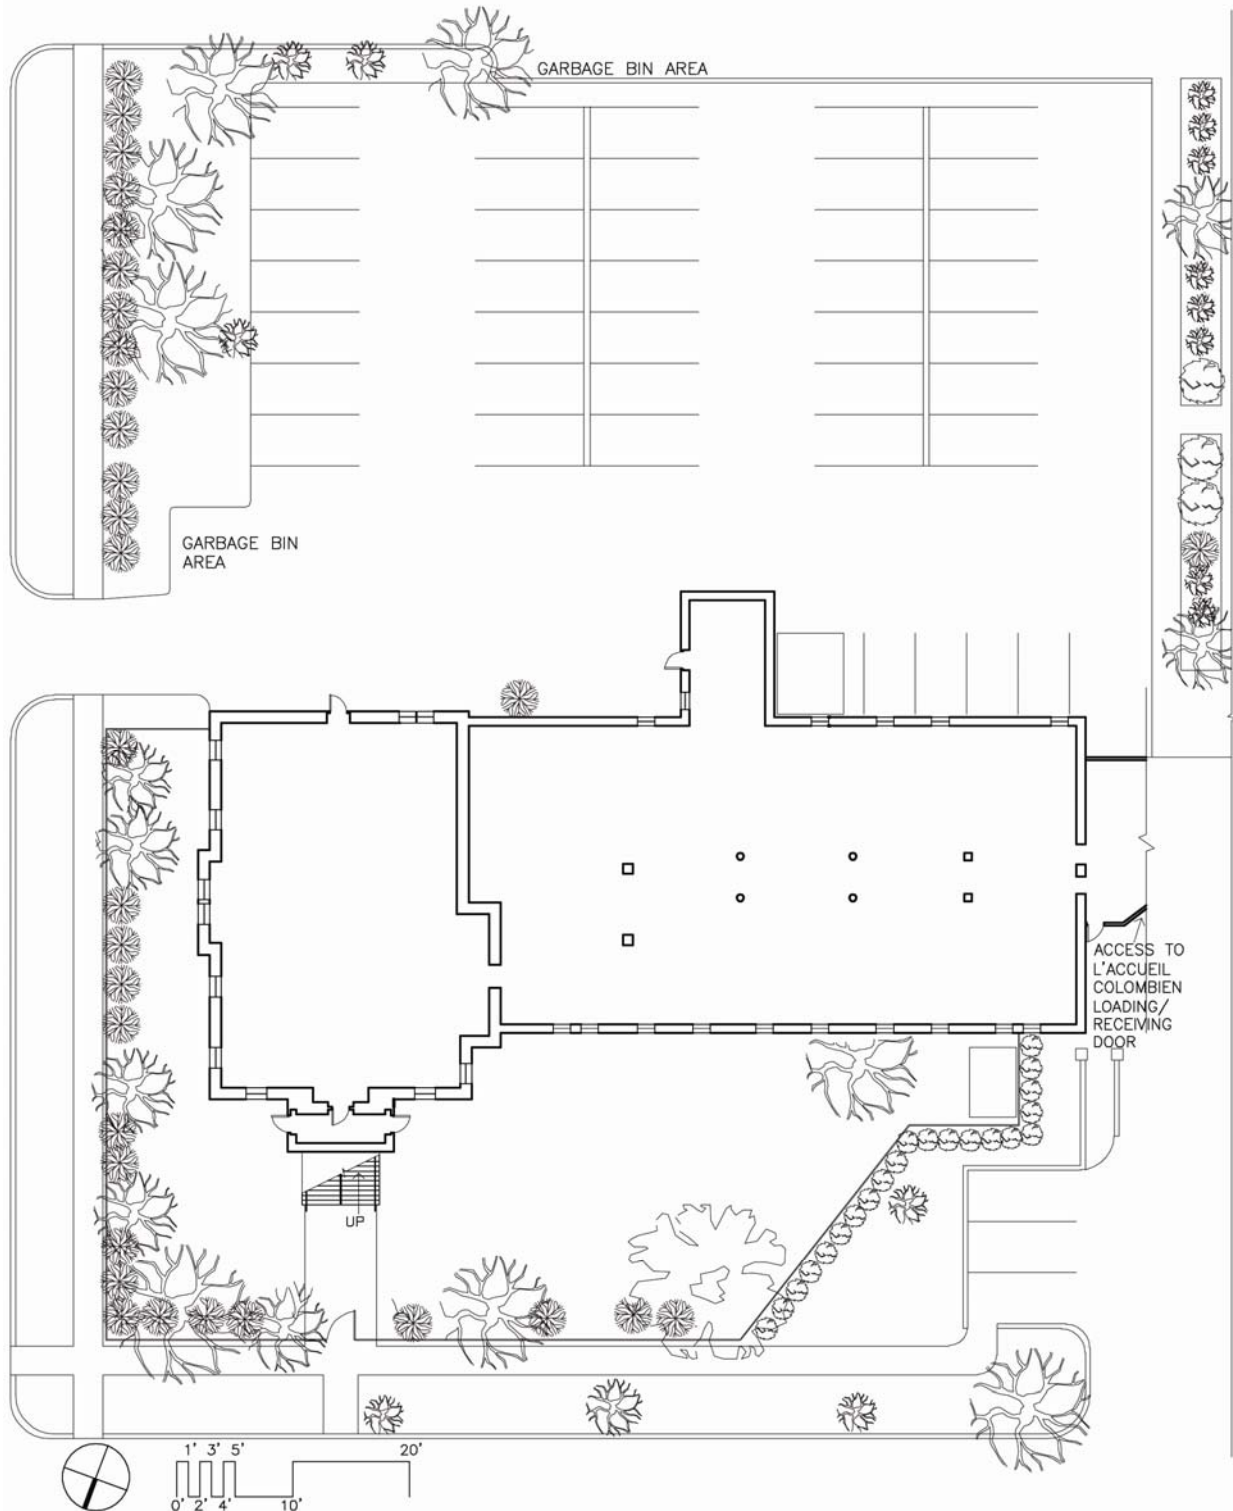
Site plan of design site depicting the existing parking lot and vegetation. Image by Natalie Foidart.
